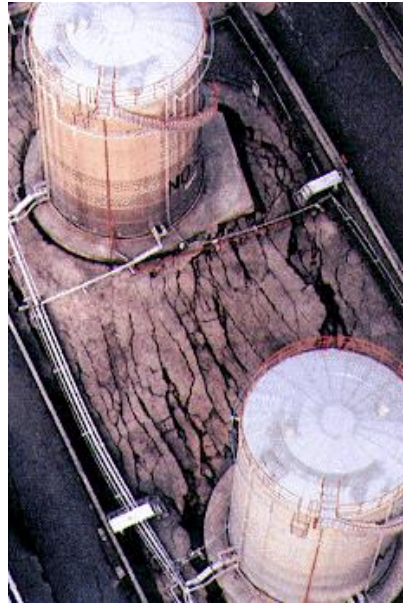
Tanks in the port area. The ground shows signs of massive liquefaction and settlement. The tanks appear to be on pile-supported foundations
